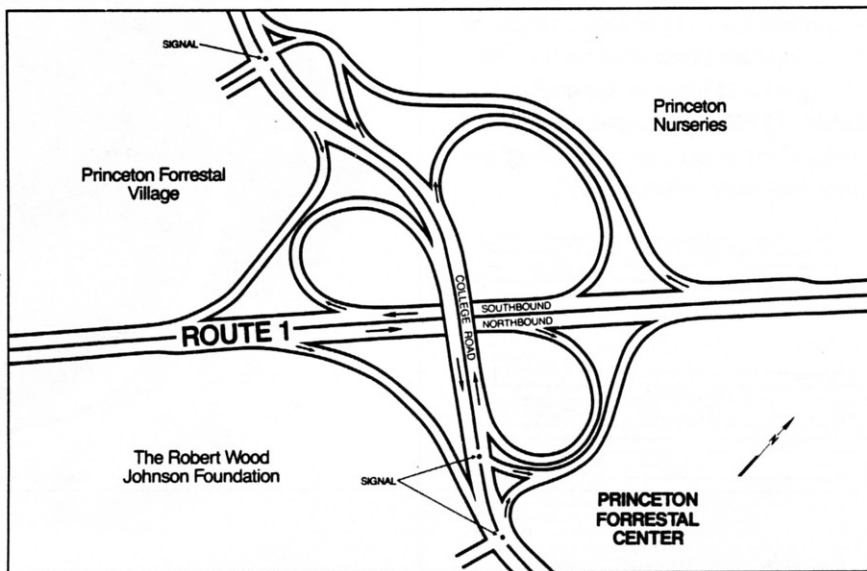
Schematic of how the College Road Overpass will look when completed.
